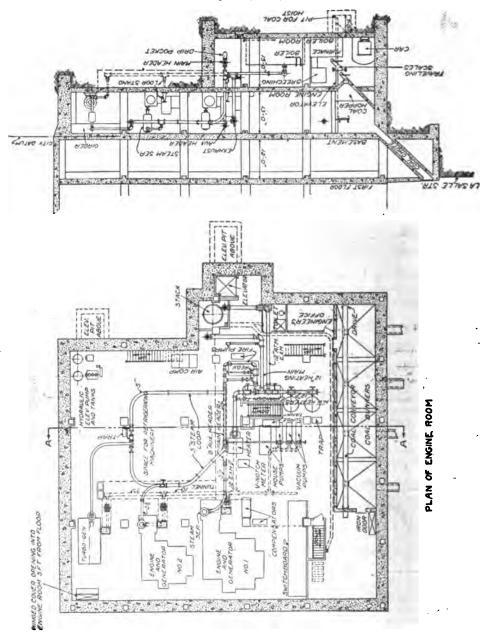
PLAN AND ELEVATION OF ENGINE-ROOM EQUIPMENT AND PRINCIPAL PIPING—LUMBER EXCHANGE BUILDING. ("Pricked Engines.")
